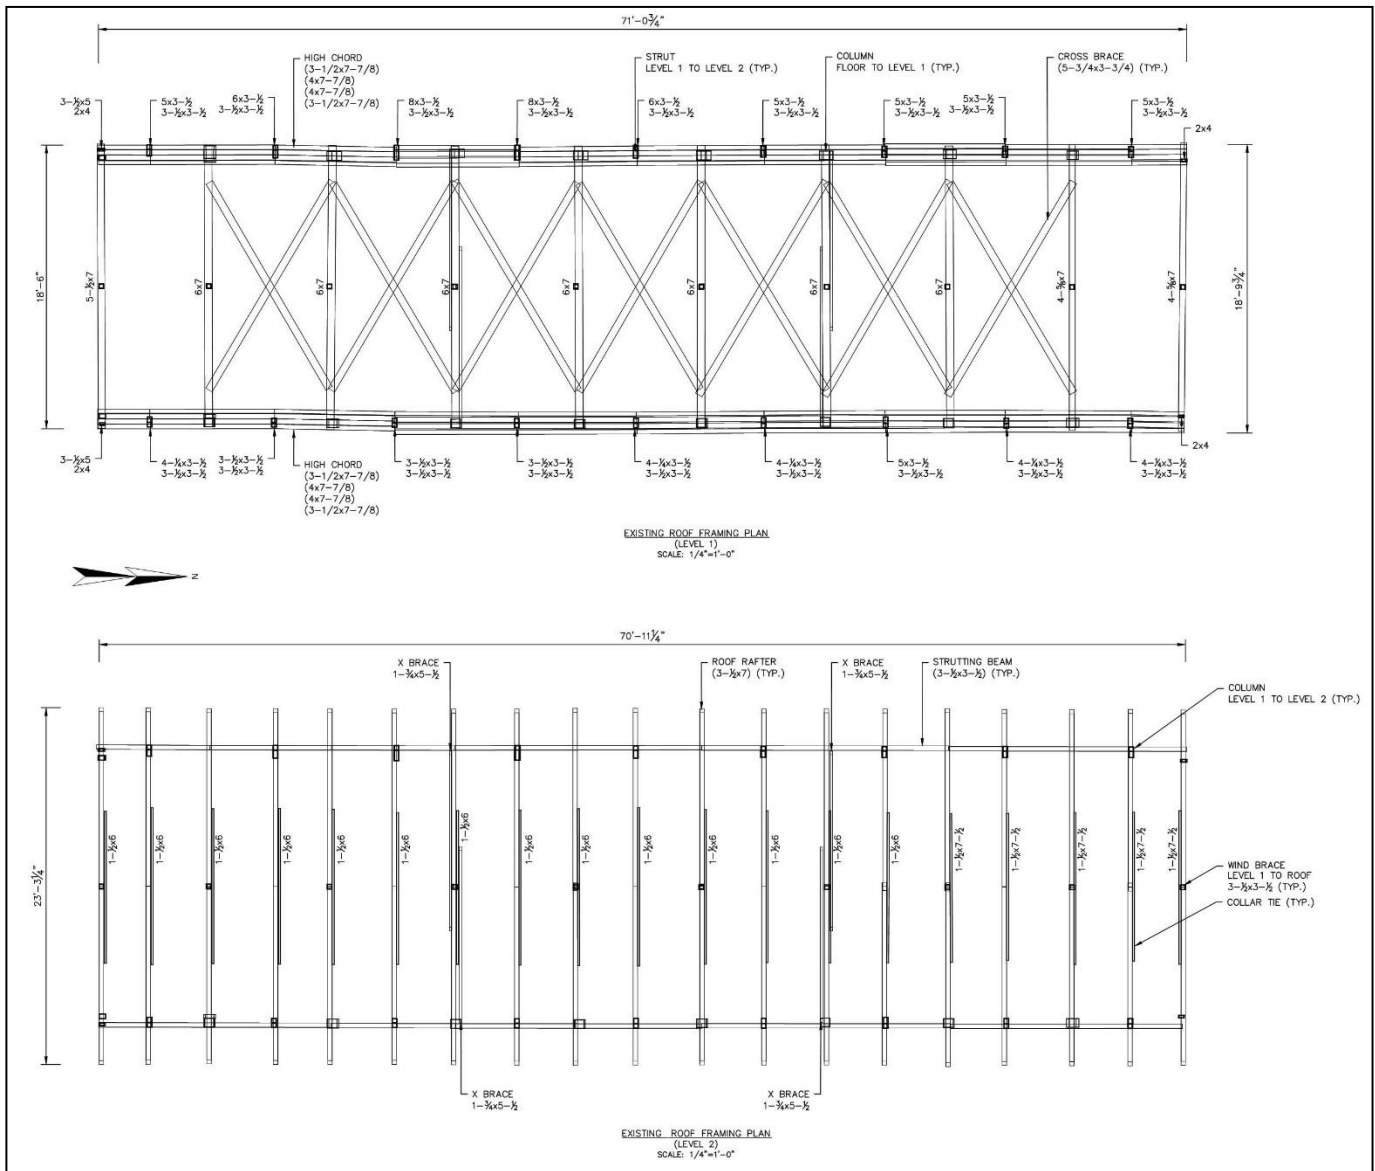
Bement Bridge, current conditions scale drawing from 3D laser field scanning August 2016, showing upper chord members, cross beams and lateral cross-bracing (top figure) and roof framing (bottom figure) showing rafters, collar ties and wind bracing (Doucet Survey, Inc. for Hoyle Tanner Associates 2016).
